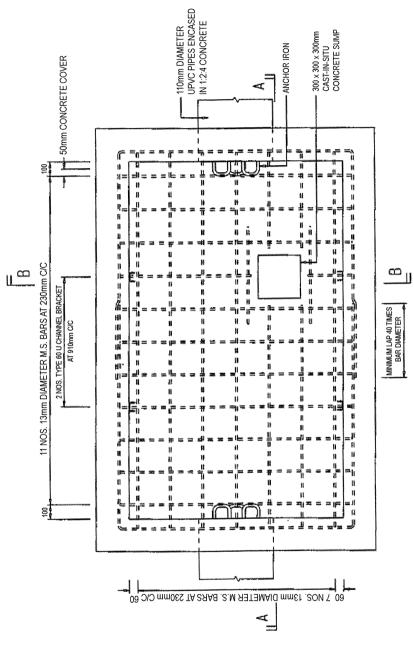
MANHOLE DRAWINGS - TYPE MX4
